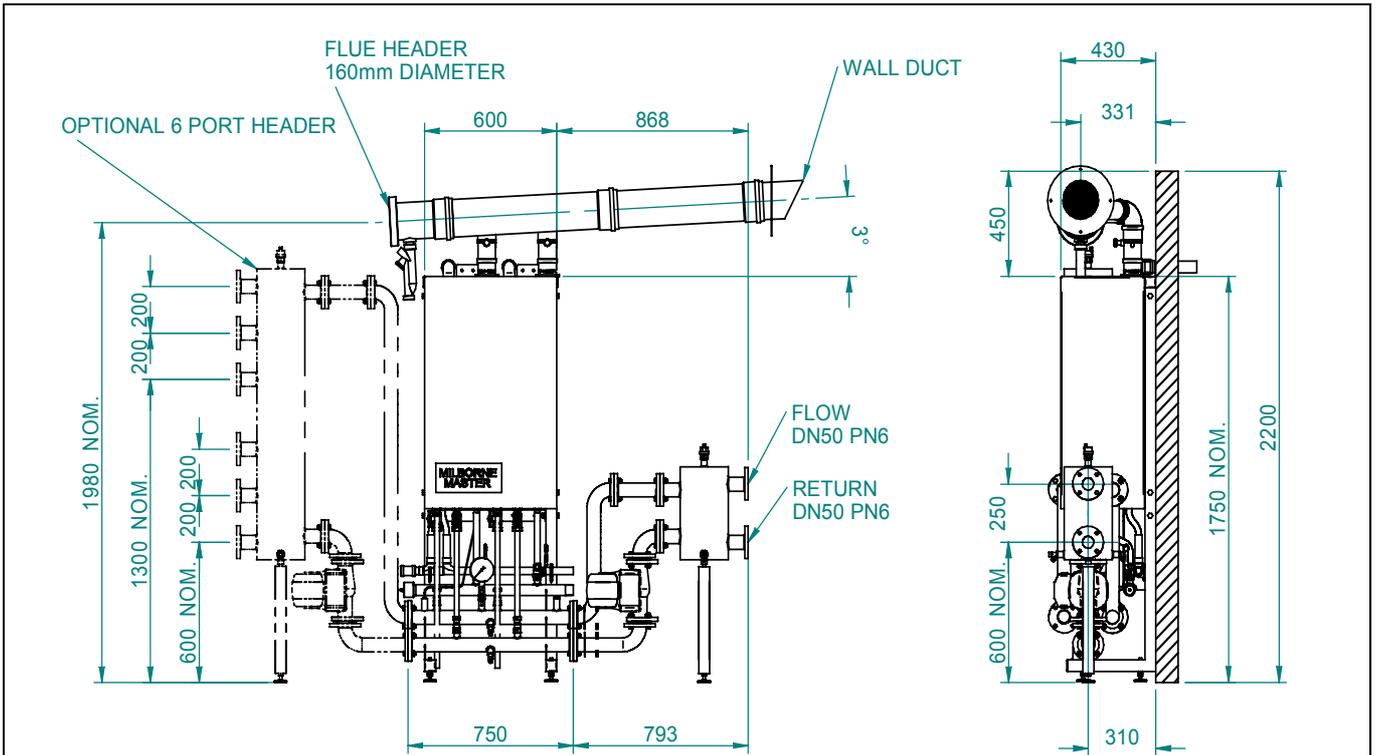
Single boiler installation dimensions - room sealed
